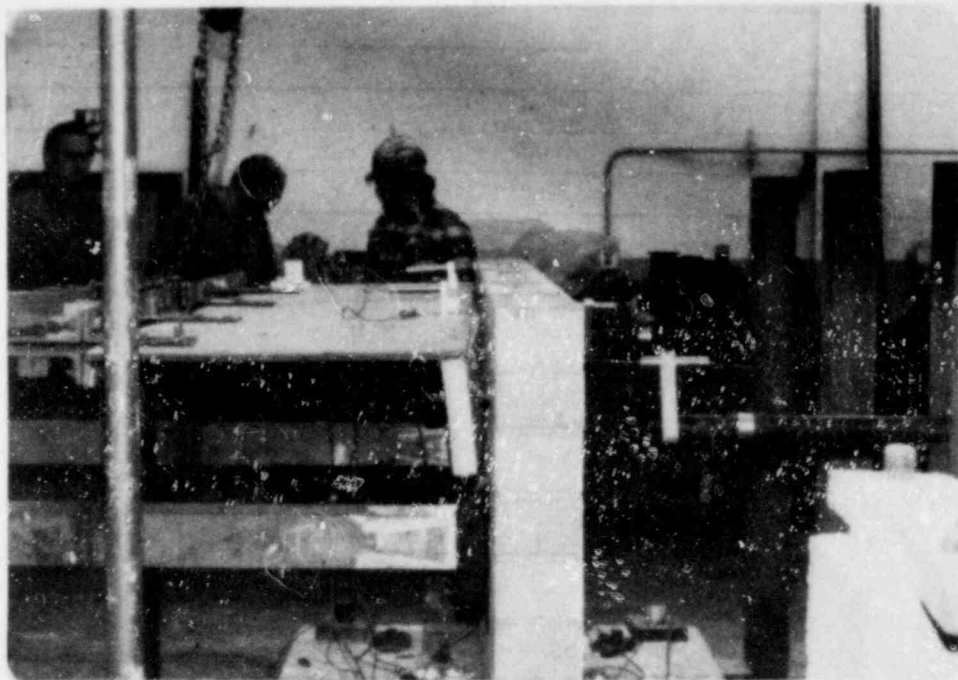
FAILURE OF LEDGER BOARD IN SPECIMEN C5-36-5/8
